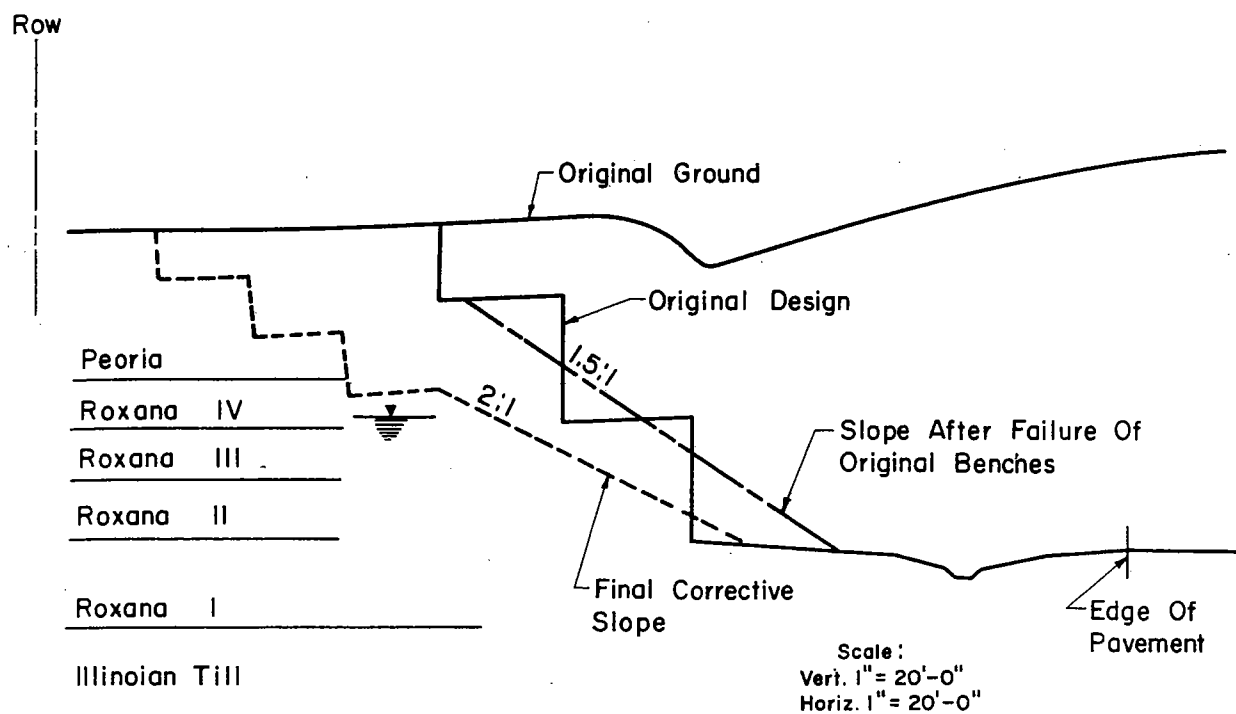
CROSS SECTION OF NORTH SLOPE ON I-270 CUT
